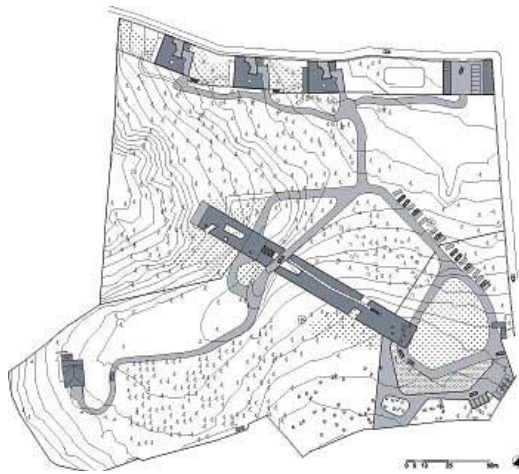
Mastenbroek & Gameren's Danish Embassy, Addis Ababa, 2005, site plan (source: URL 43)
